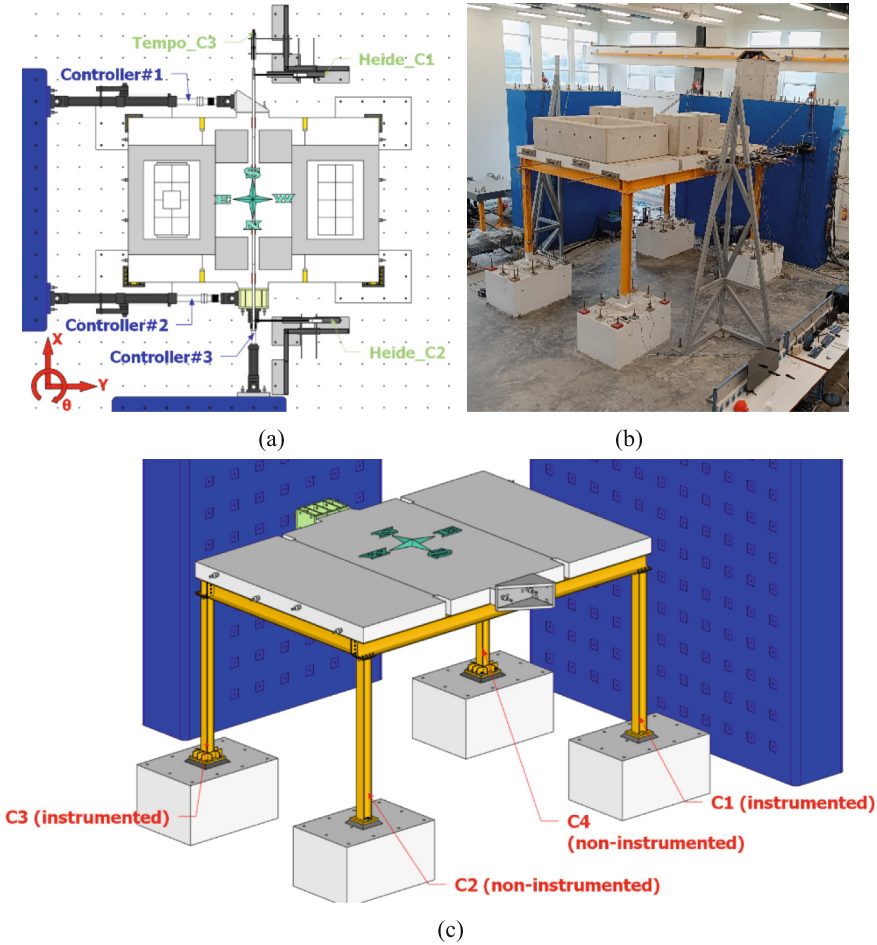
Test setup: (a) plan view of the control equipment and labelling; (b) photo of the setup; (c) 3D view of the setup and column labelling.
